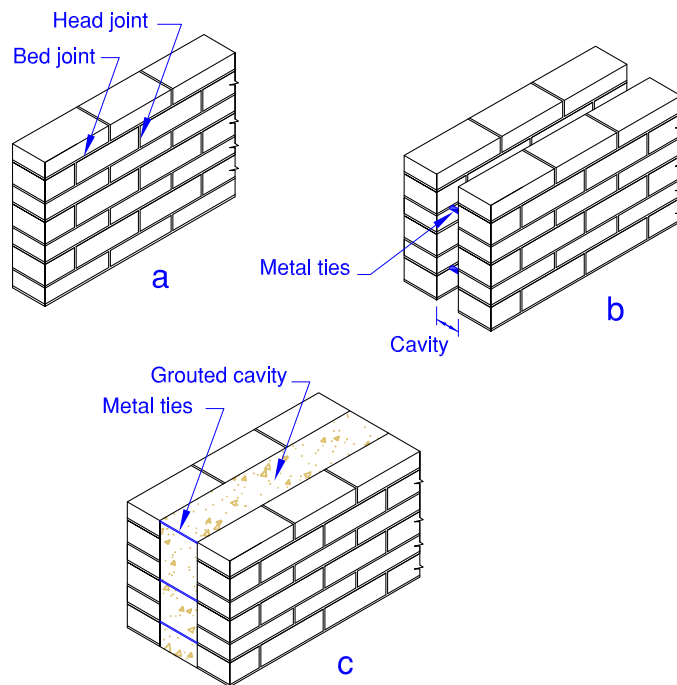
Types of masonry walls: (a) single leaf wall; (b) cavity wall; (c) composite wall [62]
